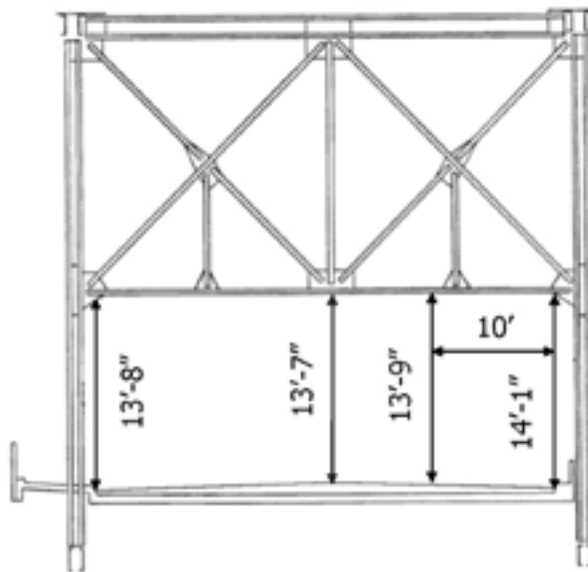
Cross-section view of through truss bridge showing vertical clearances.
